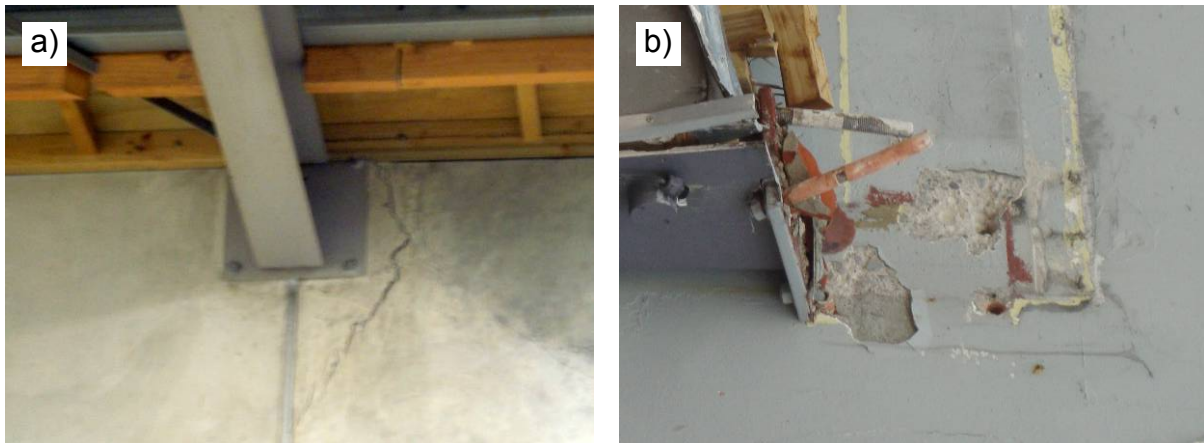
Failure of post-installed anchorages during 2011 Christchurch Earthquake: a) Concrete breakout failure (Courtesy: H. Derakhshan, P. Abercromby, R. Henry, University of Auckland); b) Pullout failure (Courtesy: J. Silva, Hilti North America)
